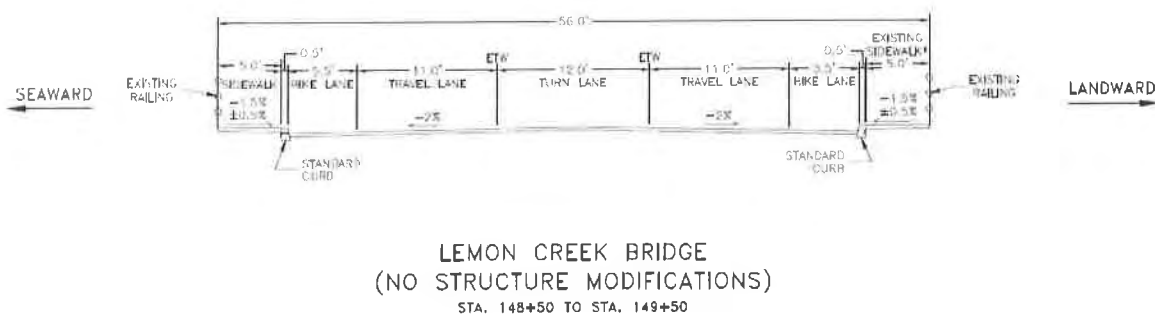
Typical Section - Lemon Creek Bridge (Bridge No. 0793)
